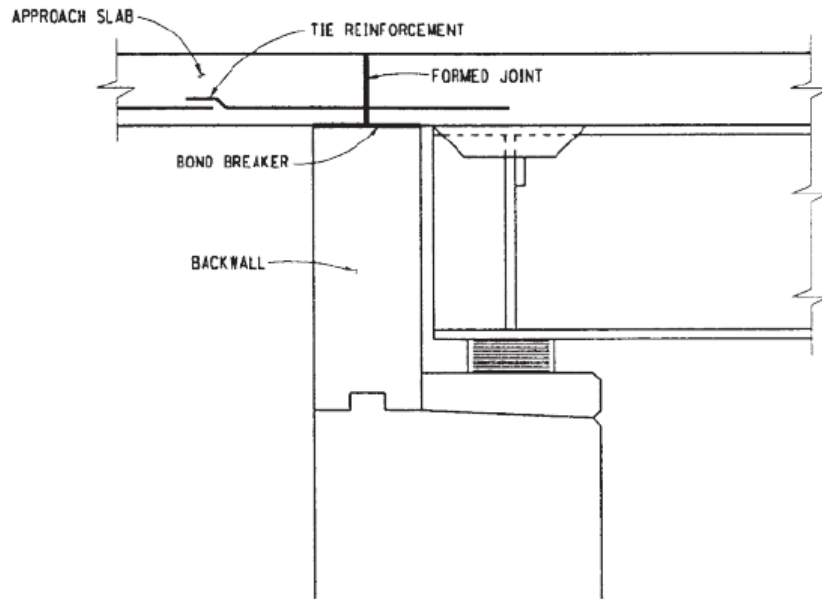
Deck extension detail in NYSDOT. Source: Miller and Jahren, 2015.
